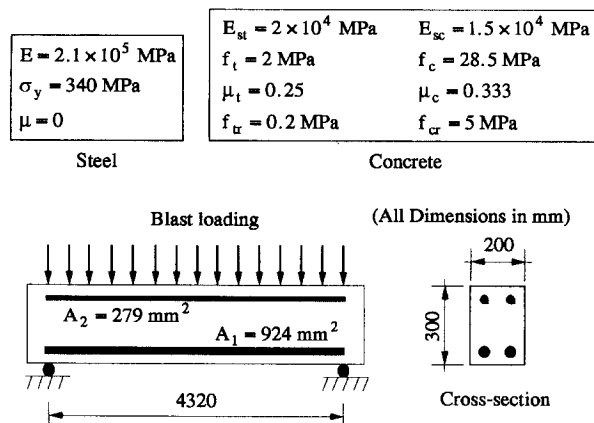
Geometric configuration and loading of reinforced concrete beam.
